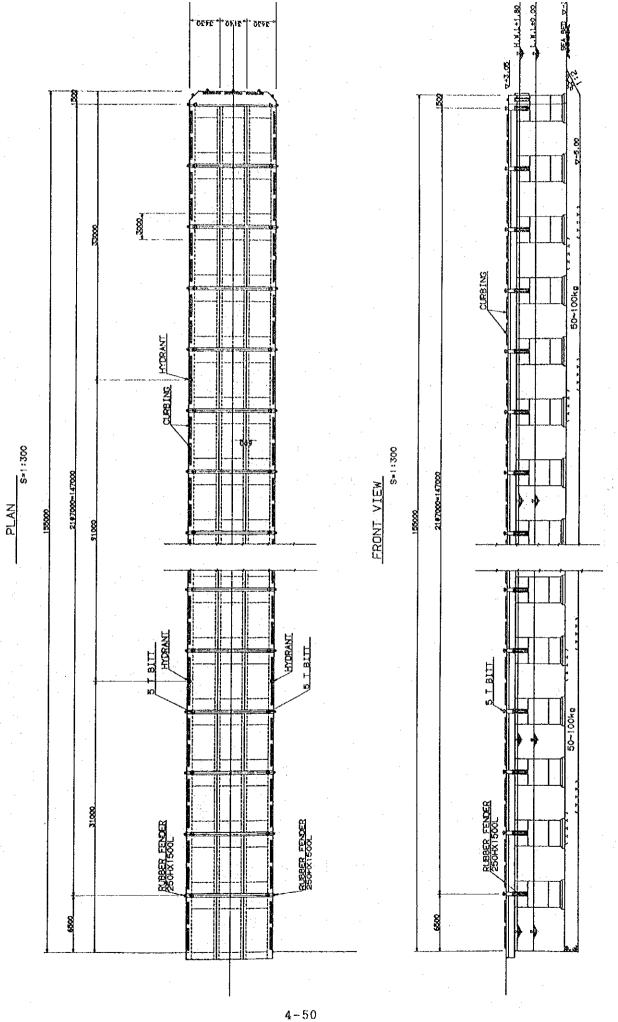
Lay-by Jetty (1) Plan & Front View
